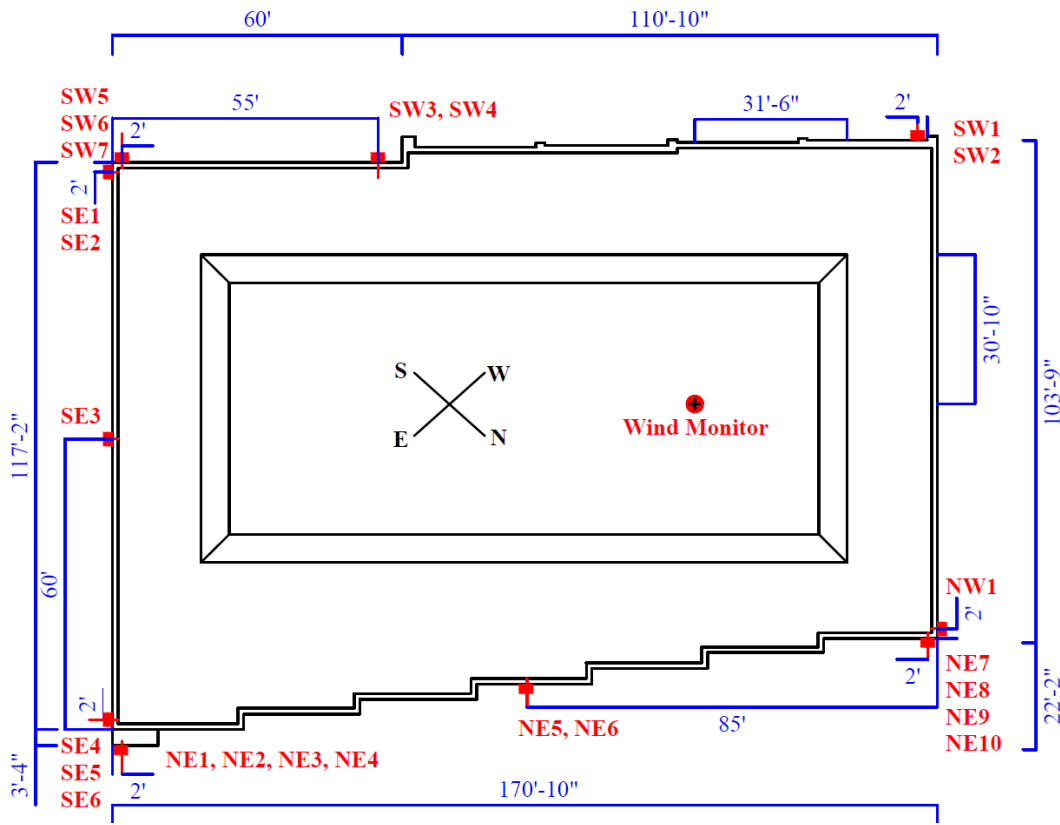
Plan view of FB Building with driving rain gauge locations
